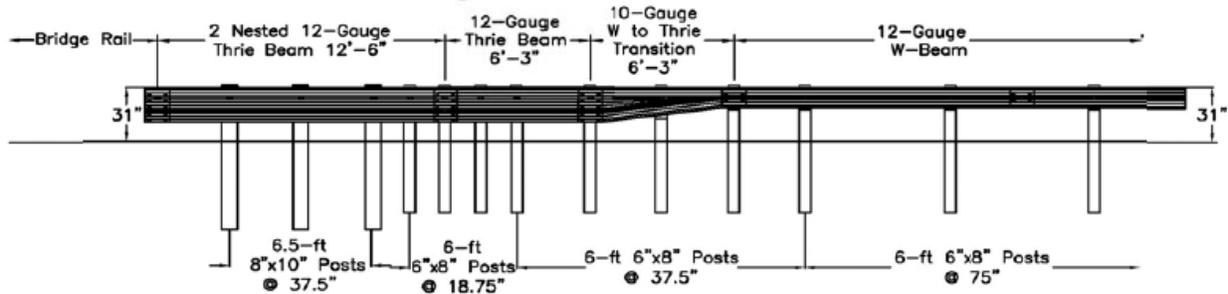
Adapted Simplified Steel-Post Stiffness Transition (Transition to Thrie Beam and Tube Bridge Railing Steel Post Version).
